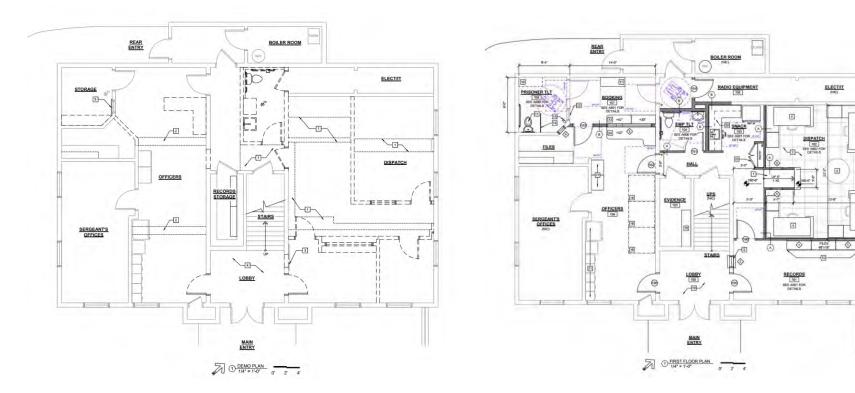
Plan Sheets Showing Existing Conditions and Proposed Alterations
